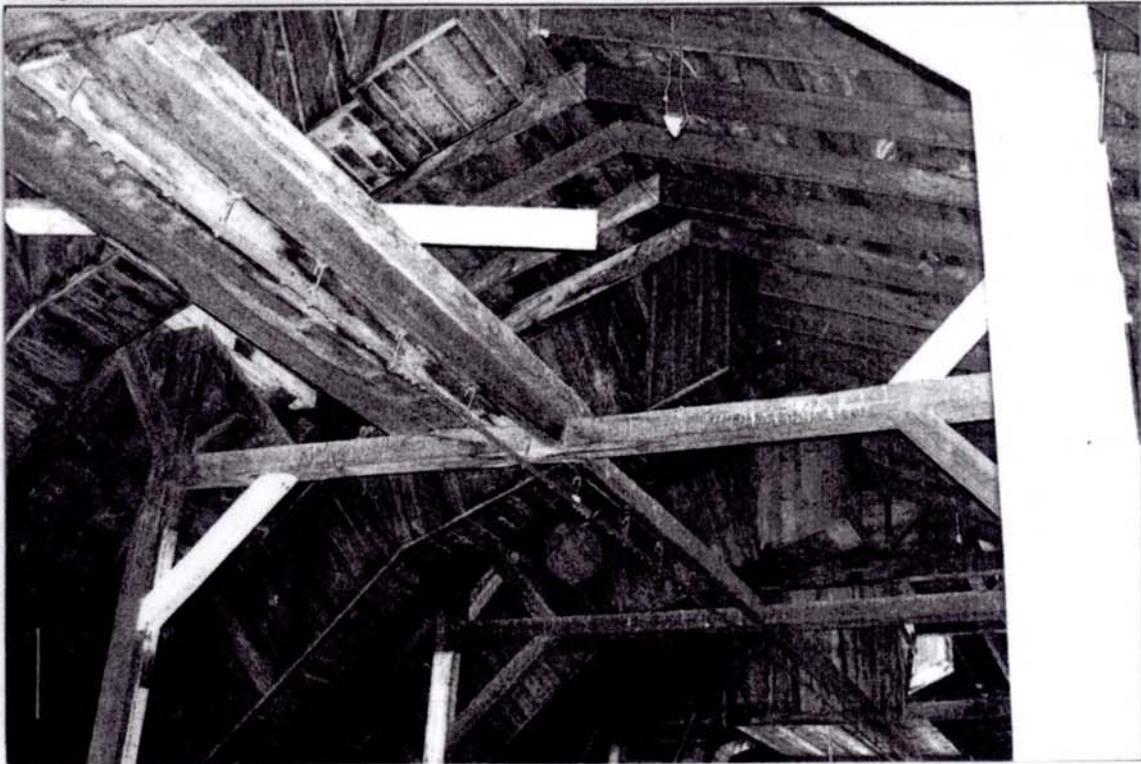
Description: Looking up toward roof structure from mezzanine of Barn
